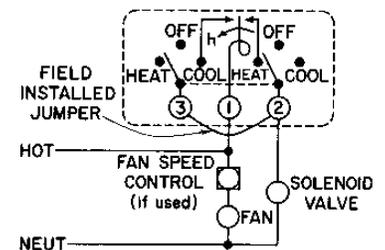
T22SFB and T22TFB (HEAT-OFF-COOL selector) can be used to control fan-coil units with cycling valve and continuous fan. Field install a jumper between terminals 2 and 3 as shown.
